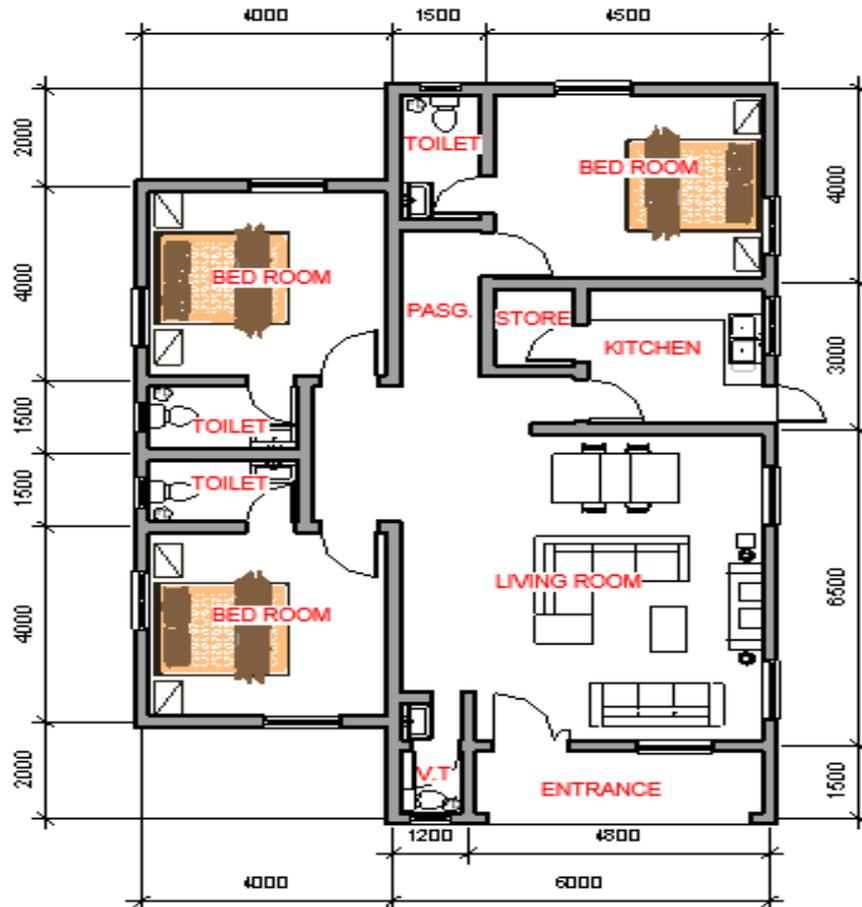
Plan & Elevation view of 3-Bedrooms of the house design using Revit
